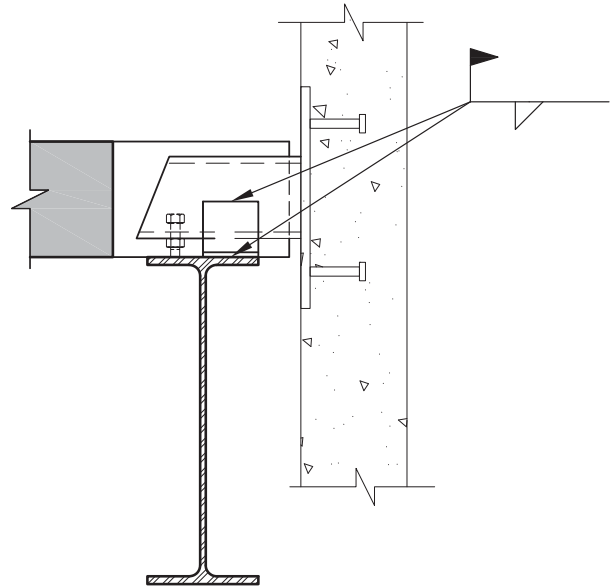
Eccentric bearing connection to spandrel beam.
